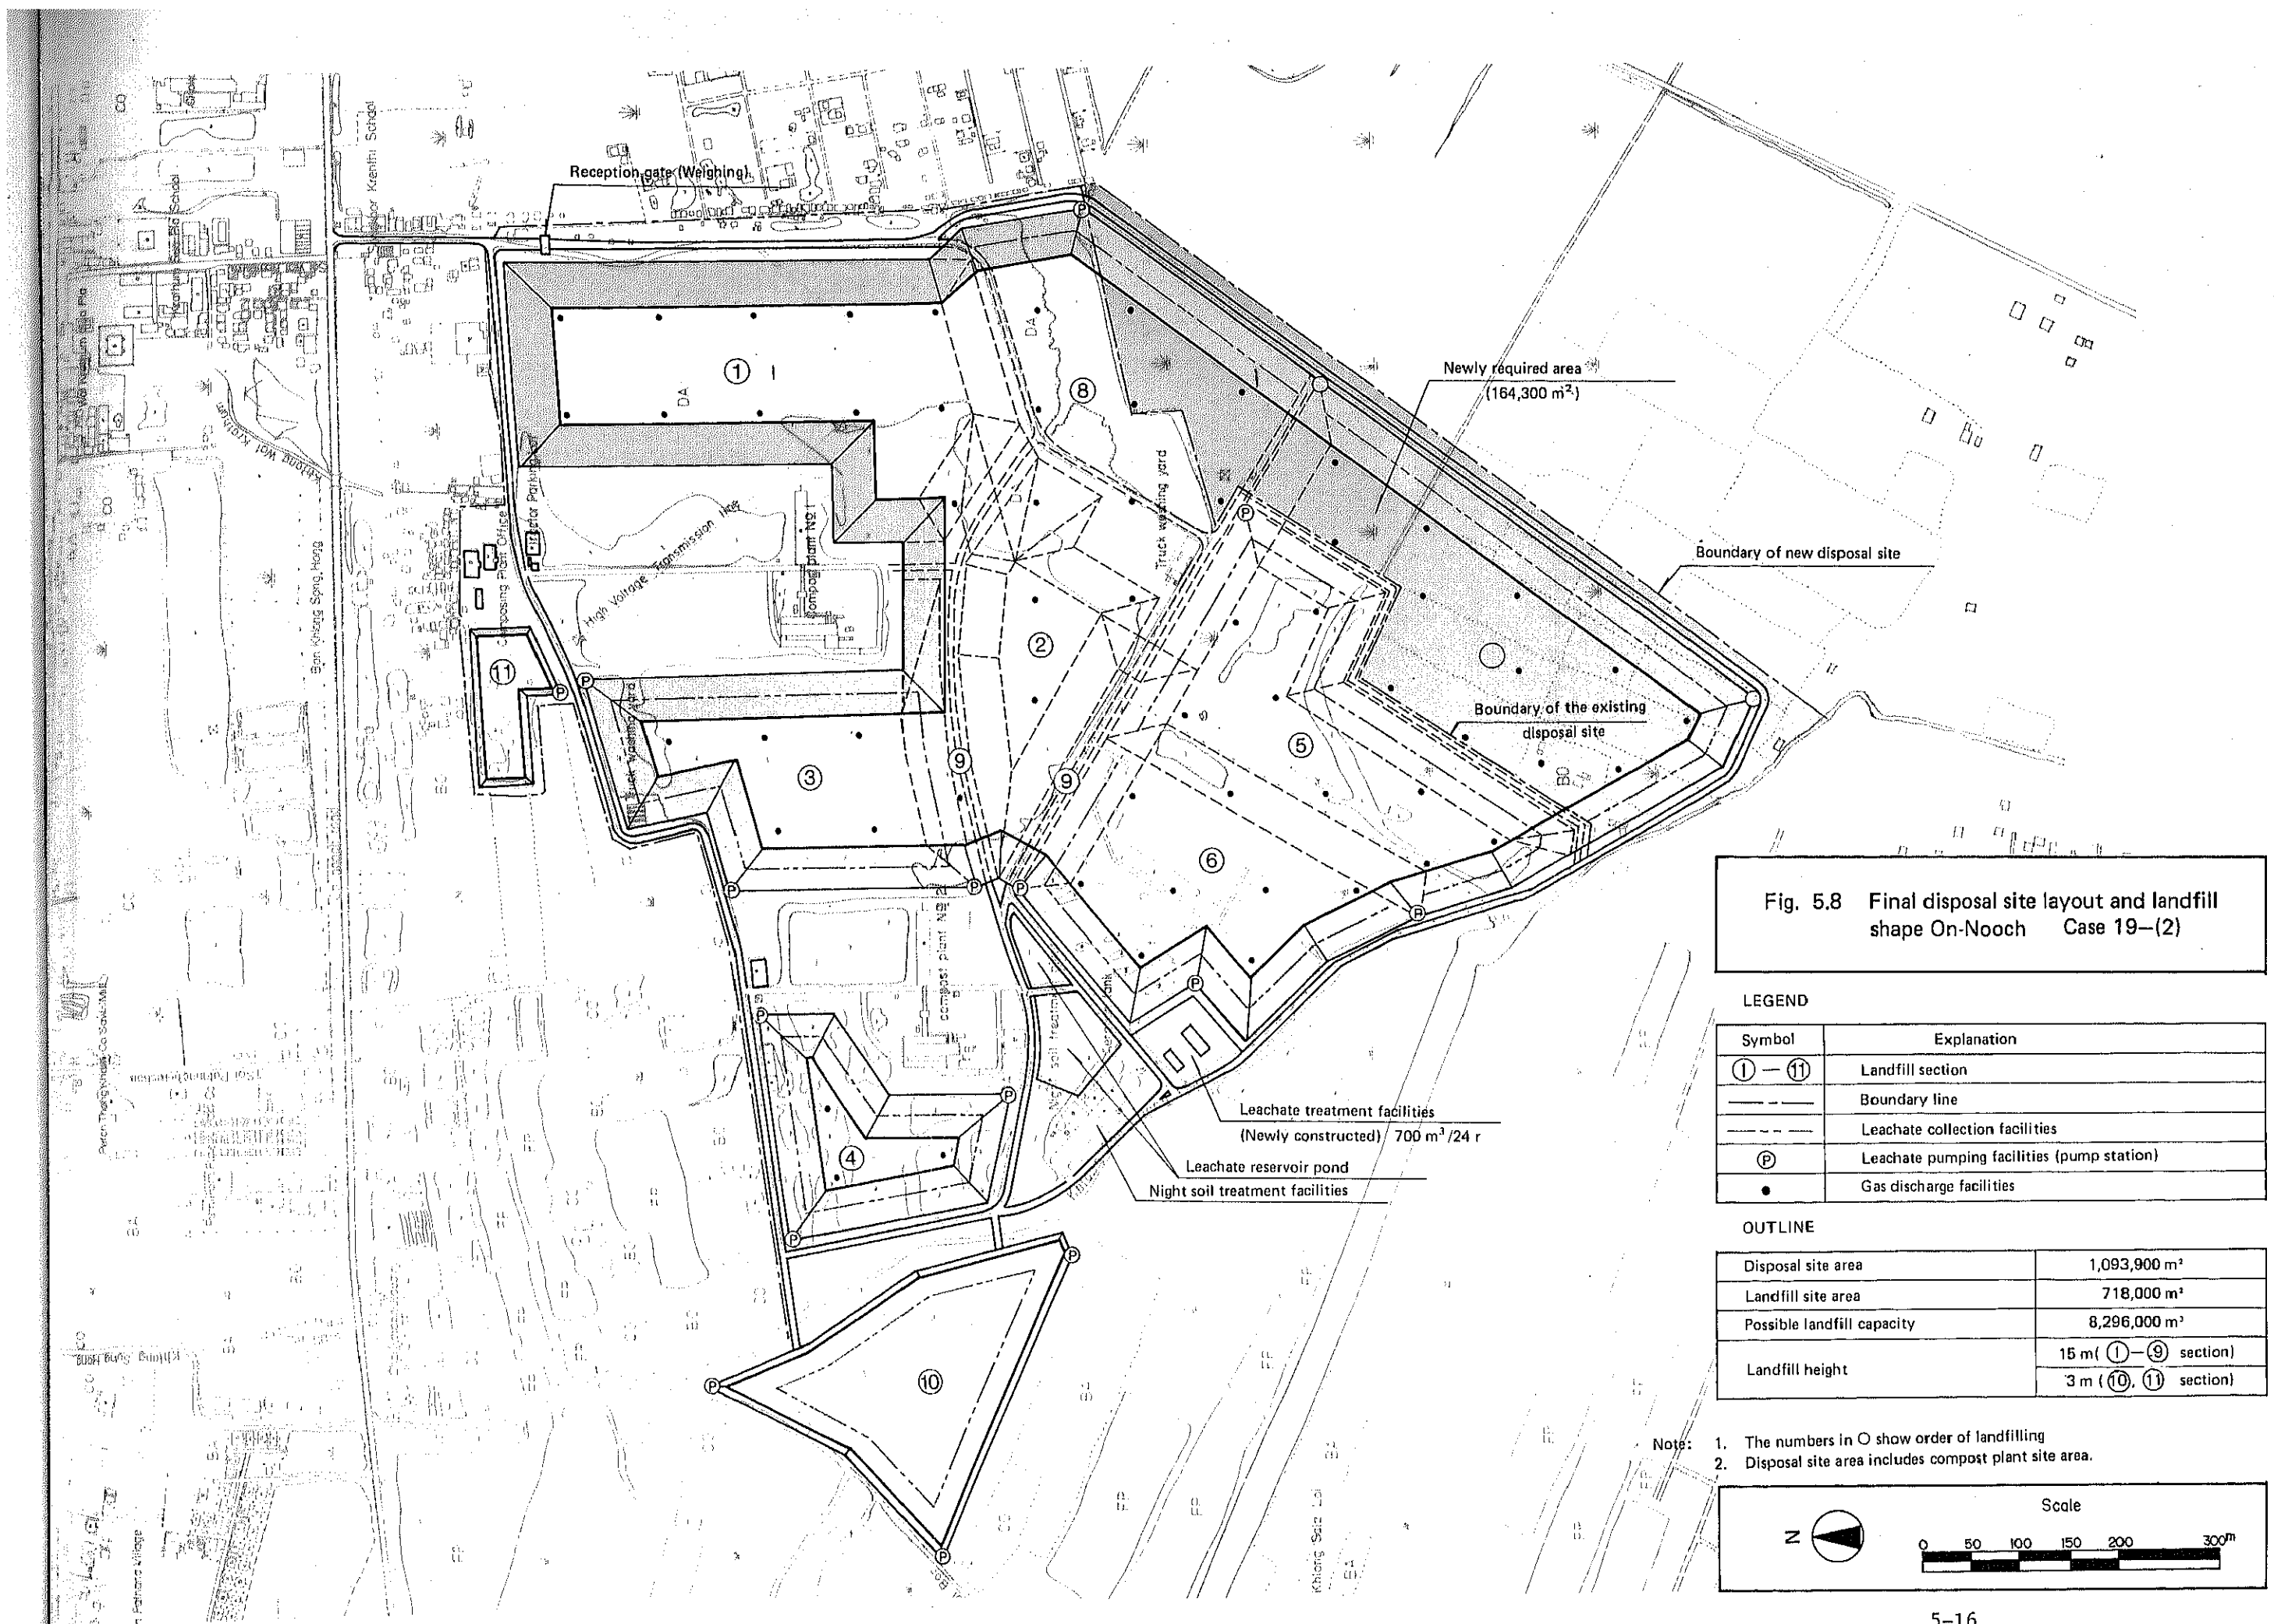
Final disposal site layout and landfill shape On-Nooch Case 19-(2)
